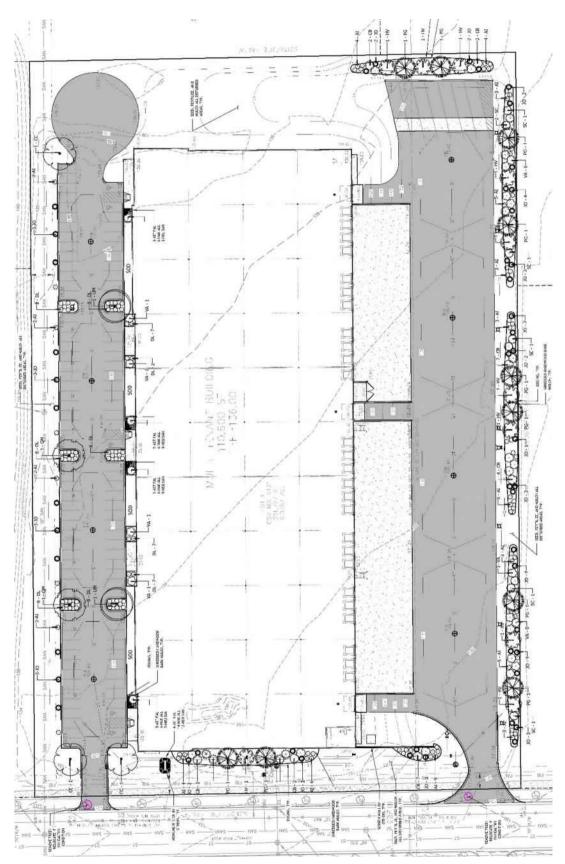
EXHIBIT A CONT'D: APPROVED SITE PLAN (ENLARGED)
